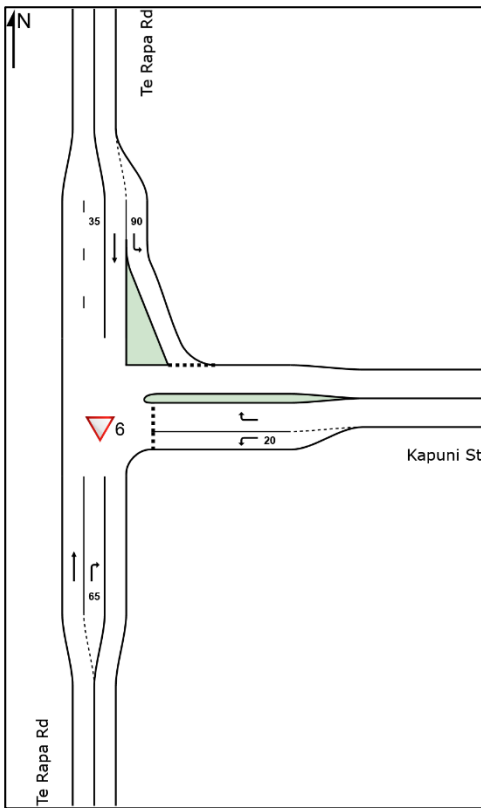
Existing Te Rapa Rd / Kapuni St Intersection Layout
